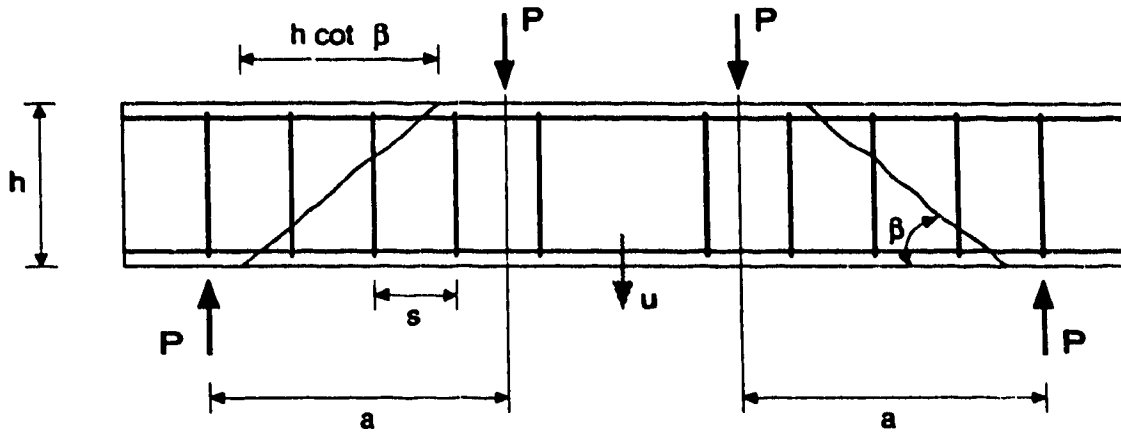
Shear Failure Mechanism for Reinforced Concrete Beam with Shear Reinforcement
